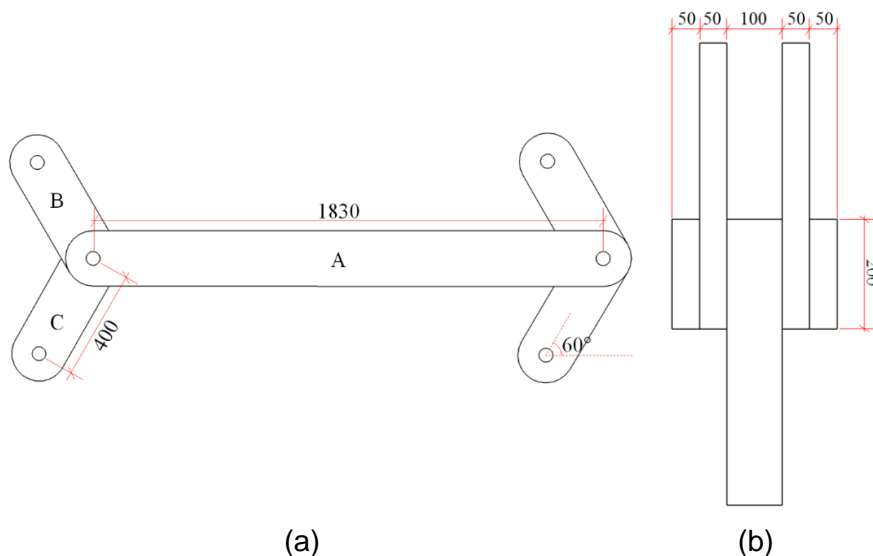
Dimensions of steel truss arrangement (all dimensions are in mm).
